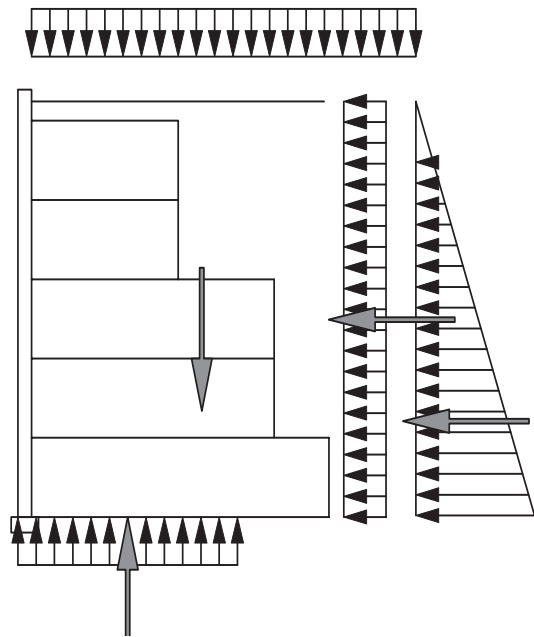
Pile Supported Bridge with T-WALL Abutment and Loading Diagram
